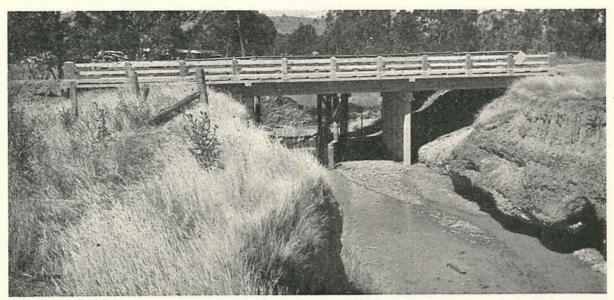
Precast Reinforced Concrete Bridge over U.T. Creek on the Upper Goulburn Road.
